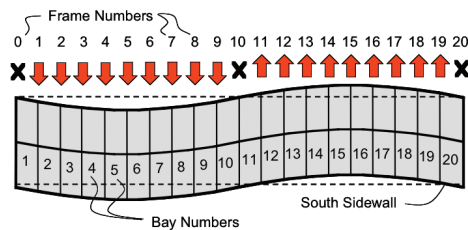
Top view of 20-bay test building with three frames locked (X-marked) and the remaining frames loaded to cause 200-foot building to behave as two 100-foot buildings (load case 100).
